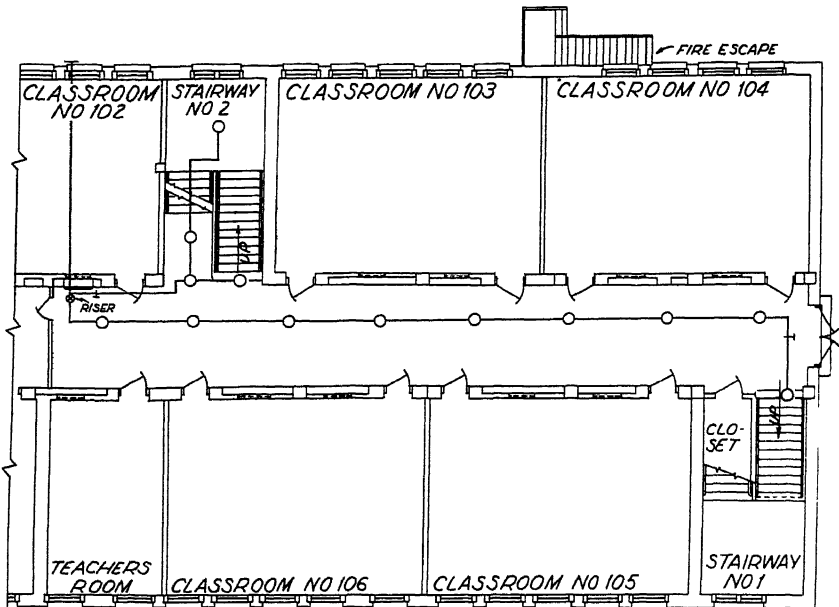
Floor plan of first floor showing location of automatic sprinklers.
